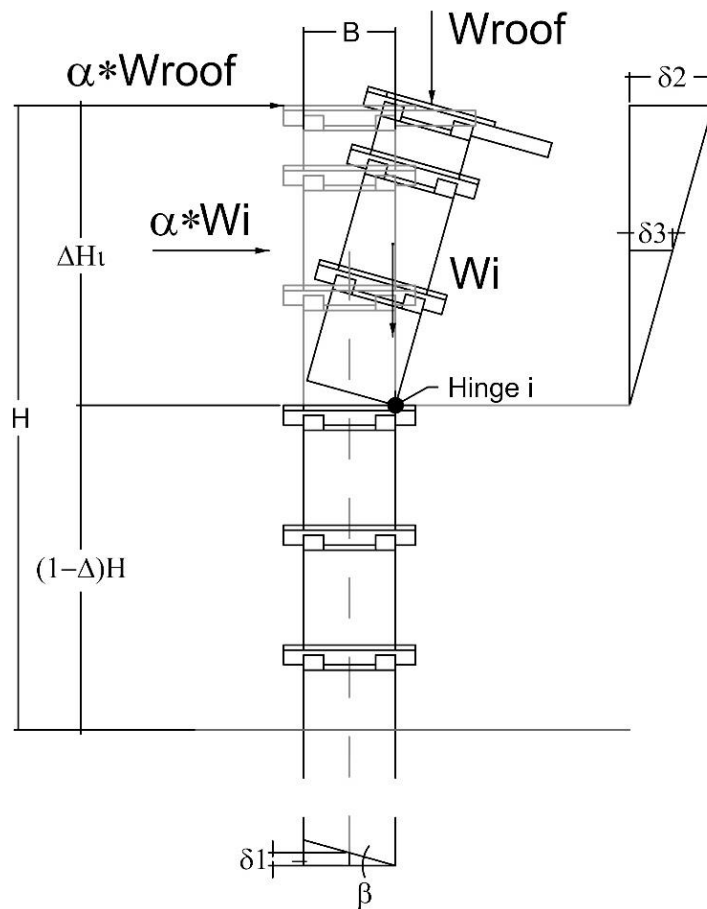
Roof force + Wall force - Overturning Blocks - a critical
